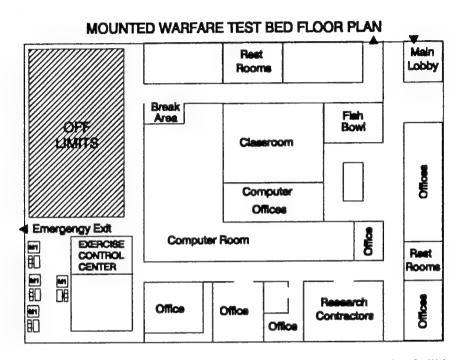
Schematic floor plan of the Mounted Warfare Test Bed (MWTB) facilities.
